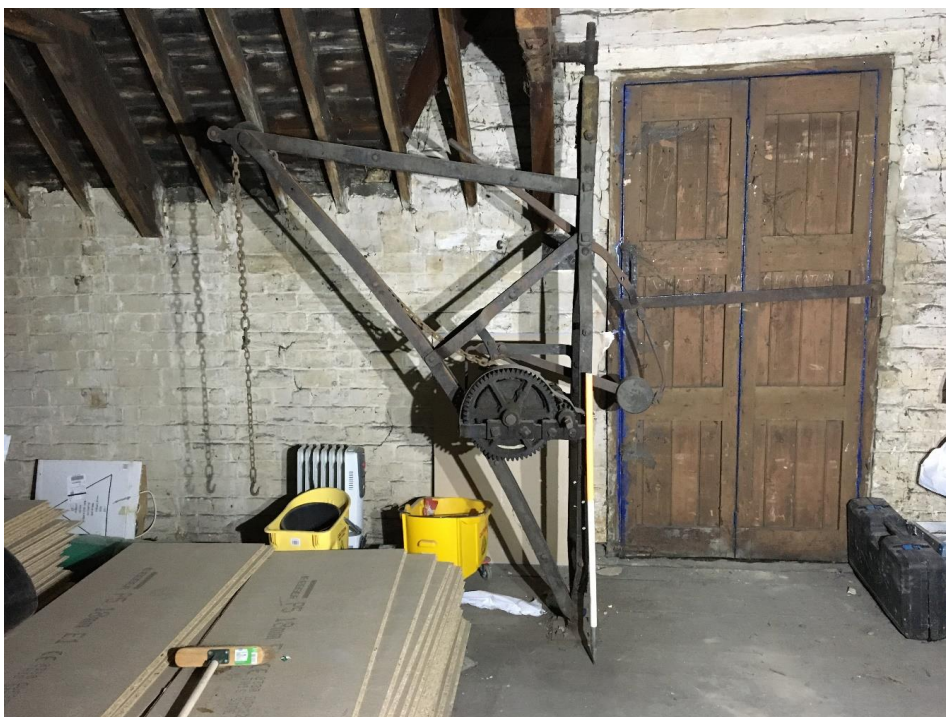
Internal view looking W showing winch structure to left of loading bay door
